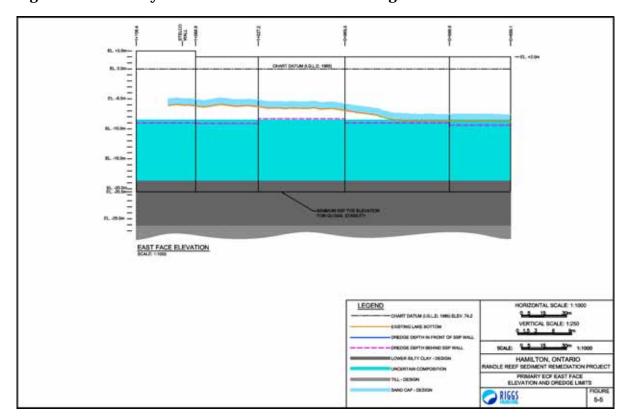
Primary ECF East Face Elevation and Dredge Limits
